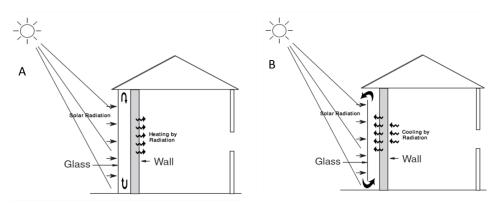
Thermal mass walls types: A- Thermal wall used for heating by radiation, B-Ventilated façade system used for passive cooling by radiation¹
